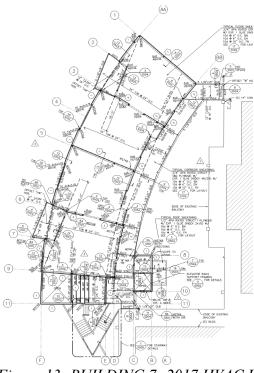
BUILDING 7: 2017 HVAC Upgrade Roof Framing Plan
